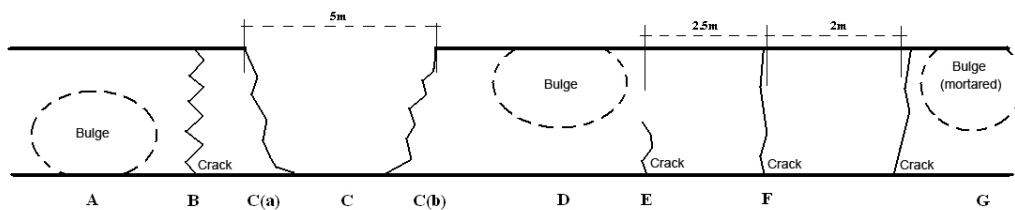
Relative locations of deformed and cracked areas of Crudwell wall
